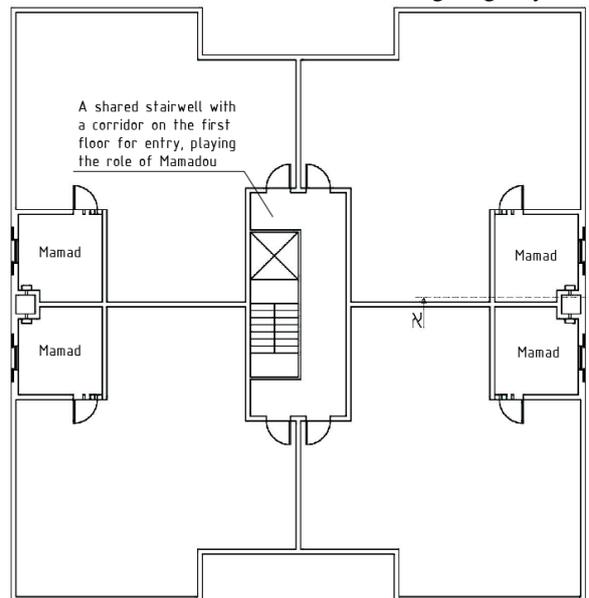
Floor plan showing the location of risers (without apartment layouts) [4].
